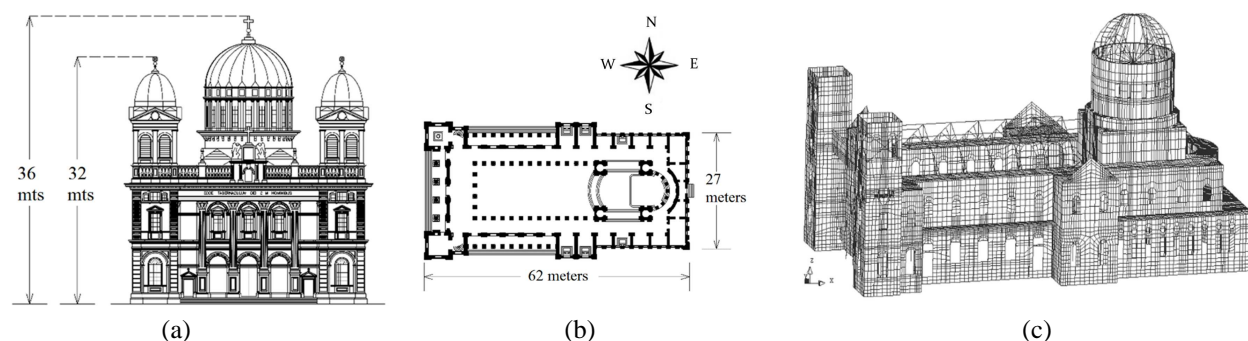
Geometry of the Blessed Sacramento Basilica: (a) west elevation; (b) plan; (c) the assumed FE numerical model
